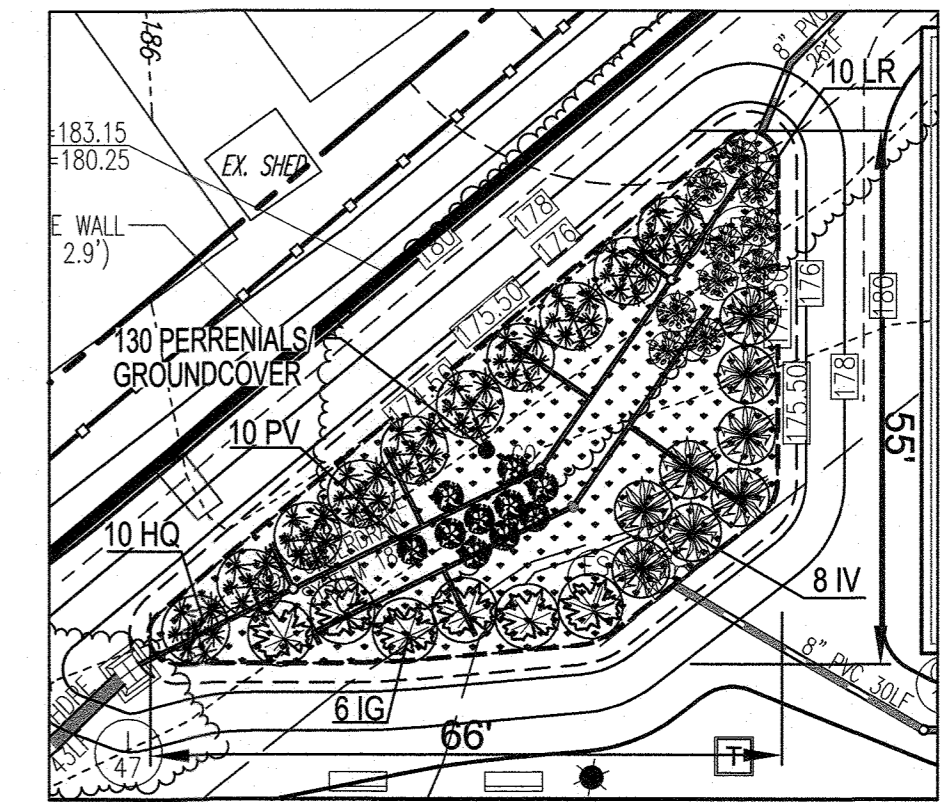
DETAILED BIO AND PLANTING PLAN (SWM #16)
